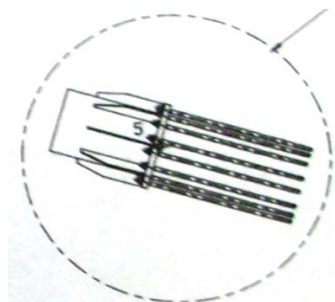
Connection between the arch tubes and the concrete slab by 16 bolts
